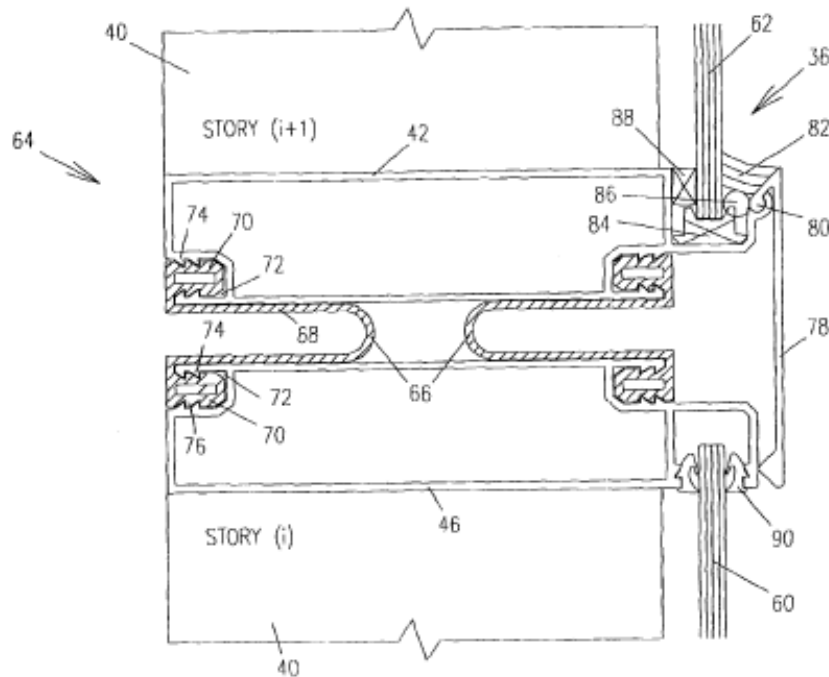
Vertical section of the seismic decoupler joint through line 9-9 of Figure 9.5
